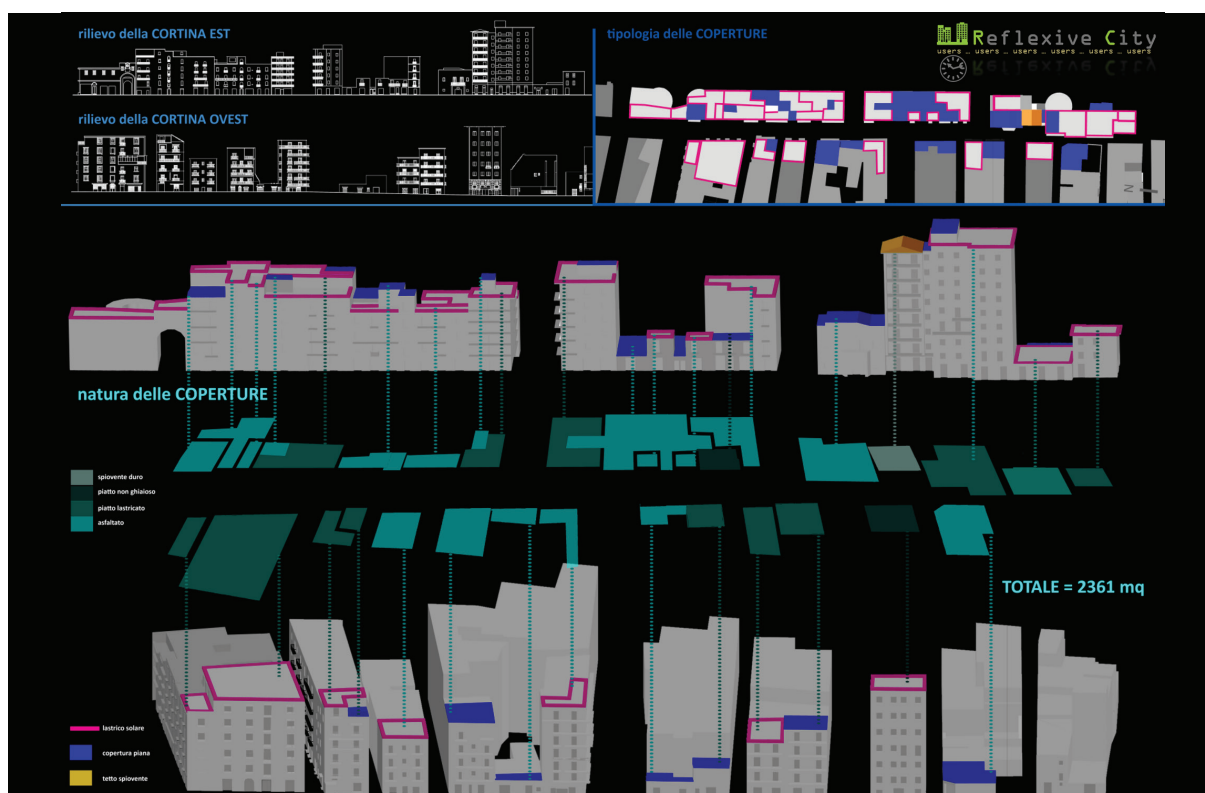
Kind of roofing surfaces in Via Sopramuro buildings. Source: M. Buanne.
